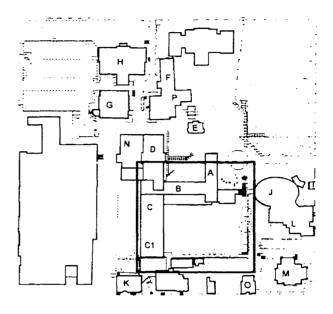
Existing campus site plan. From Dalhousie Architectural Services Department, Facilities Management.
